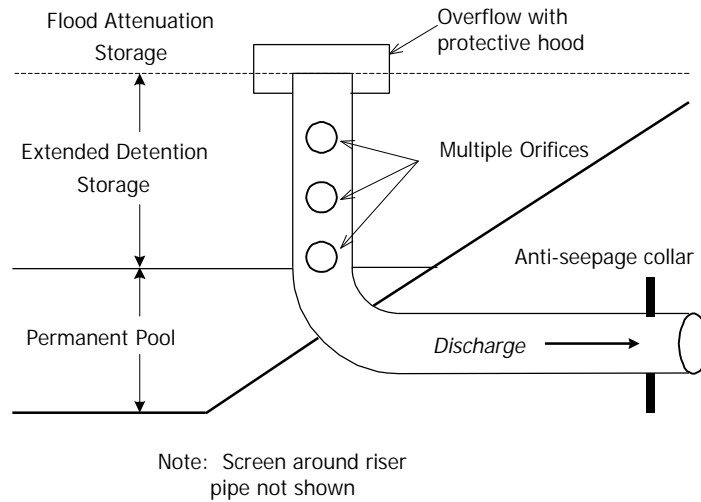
Typical Riser Pipe Wetland Outlet (W&RC, 1998)
